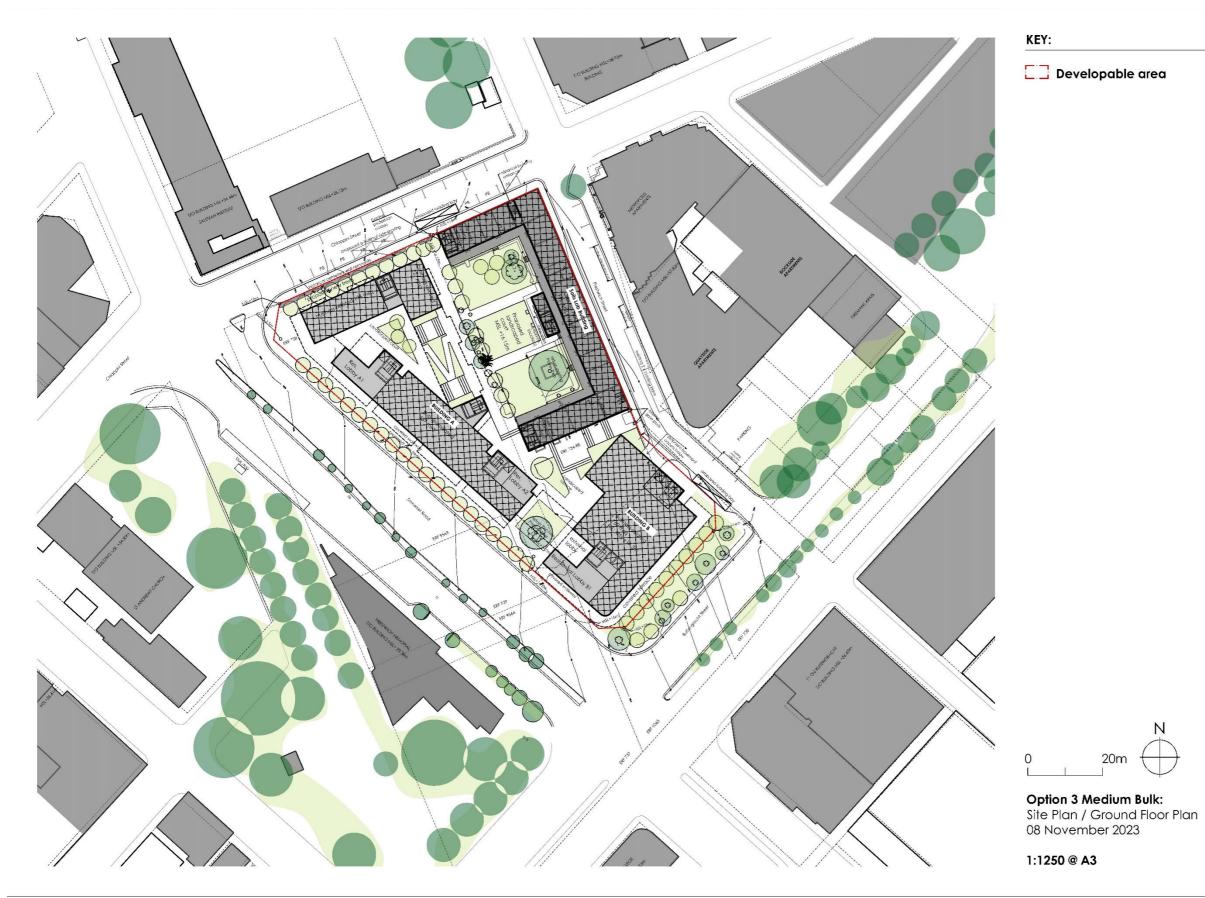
Conceptual Development Proposal Ground Floor Plan
